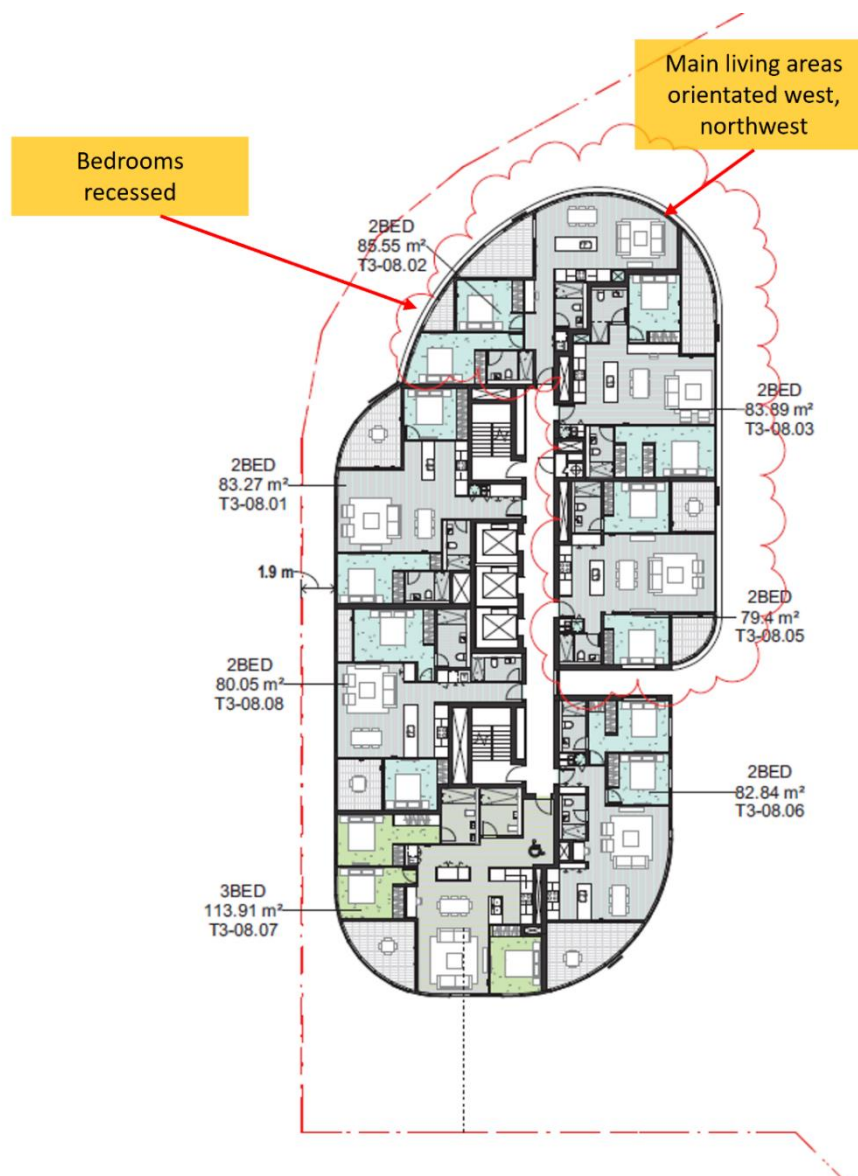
12-40 Langston Place floor plan layout levels 4 to 8 (Source: DA/234/2016 Architectus)
